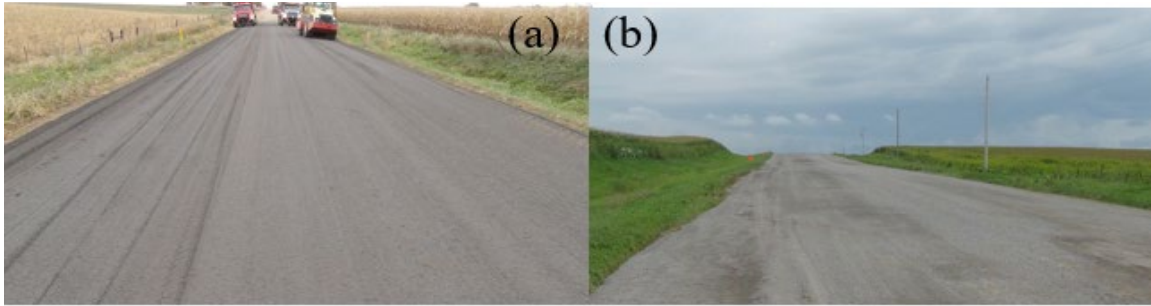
Harsco slag sections at end of construction: (a) Cherokee and (b) Howard County
